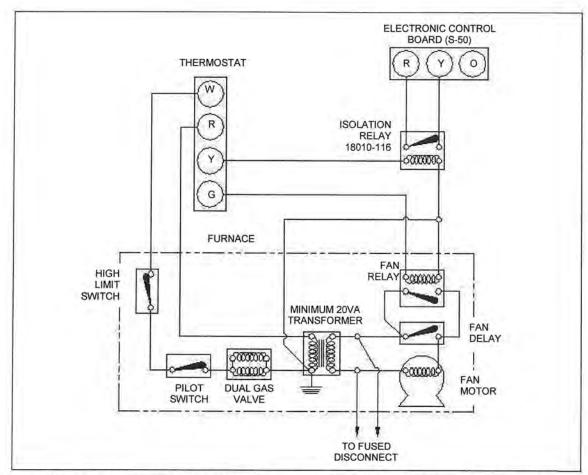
SINGLE THERMOSTAT USED FOR BOTH HEATING AND COOLING CONTROL ON A FURNACE
